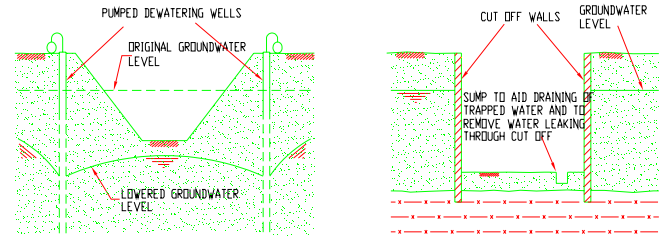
Different methods of underground water control in foundation excavation (Cashman et al., 2001)
